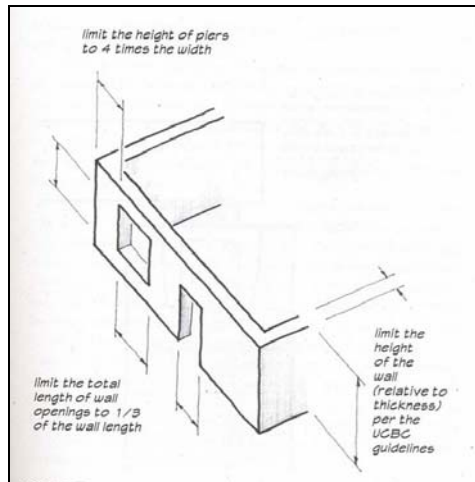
Wall Component Proportions. To ensure earth wall stability, certain wall proportions must be maintained (King, 1996).
